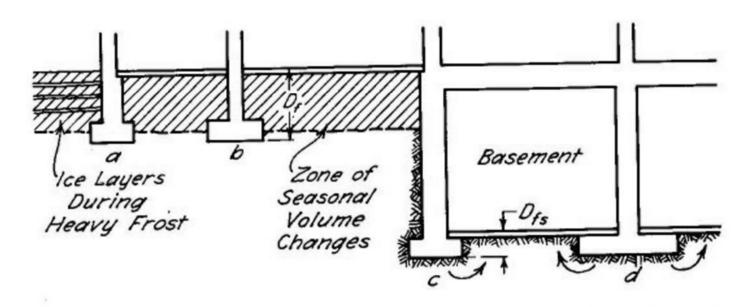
Simplified section through footing foundation of building with basement beneath its central part.
